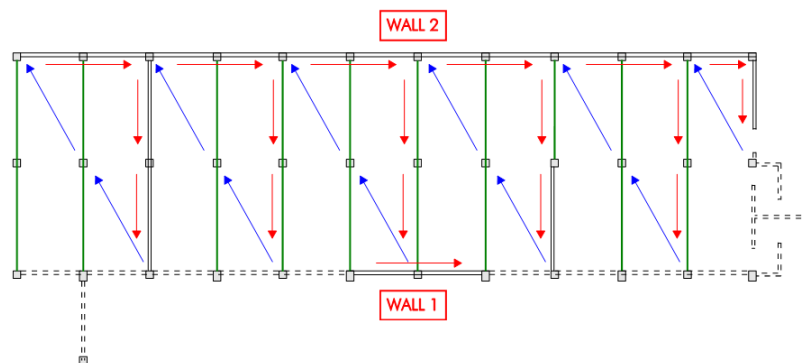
Diaphragm Shear transfer from Wall 1 to Wall 2
